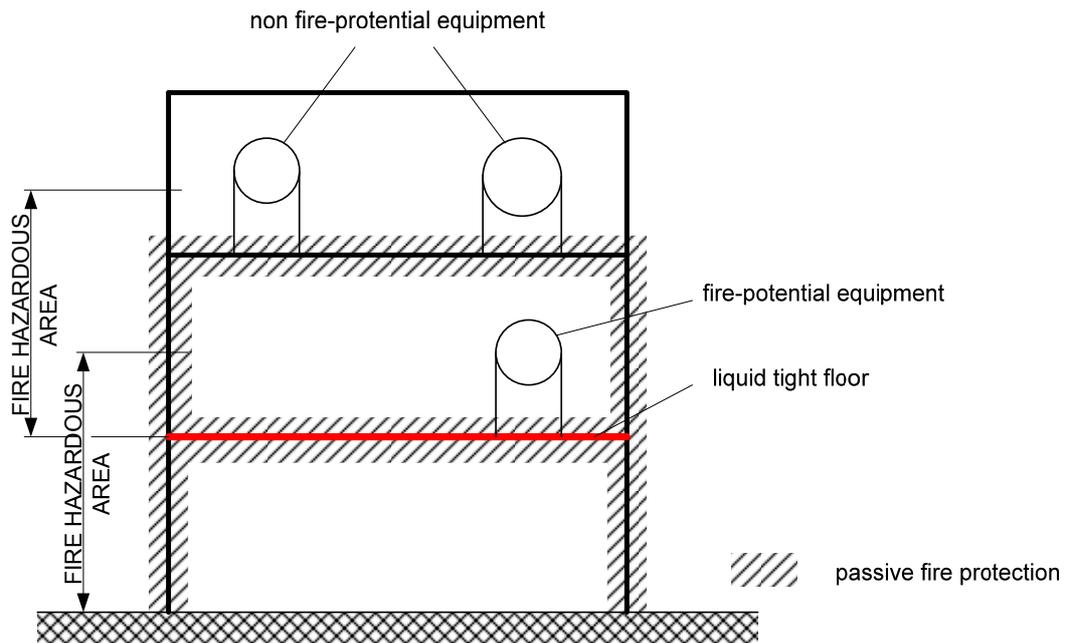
B – Structure Supporting Fire Potential and non-Fire Potential Equipment
